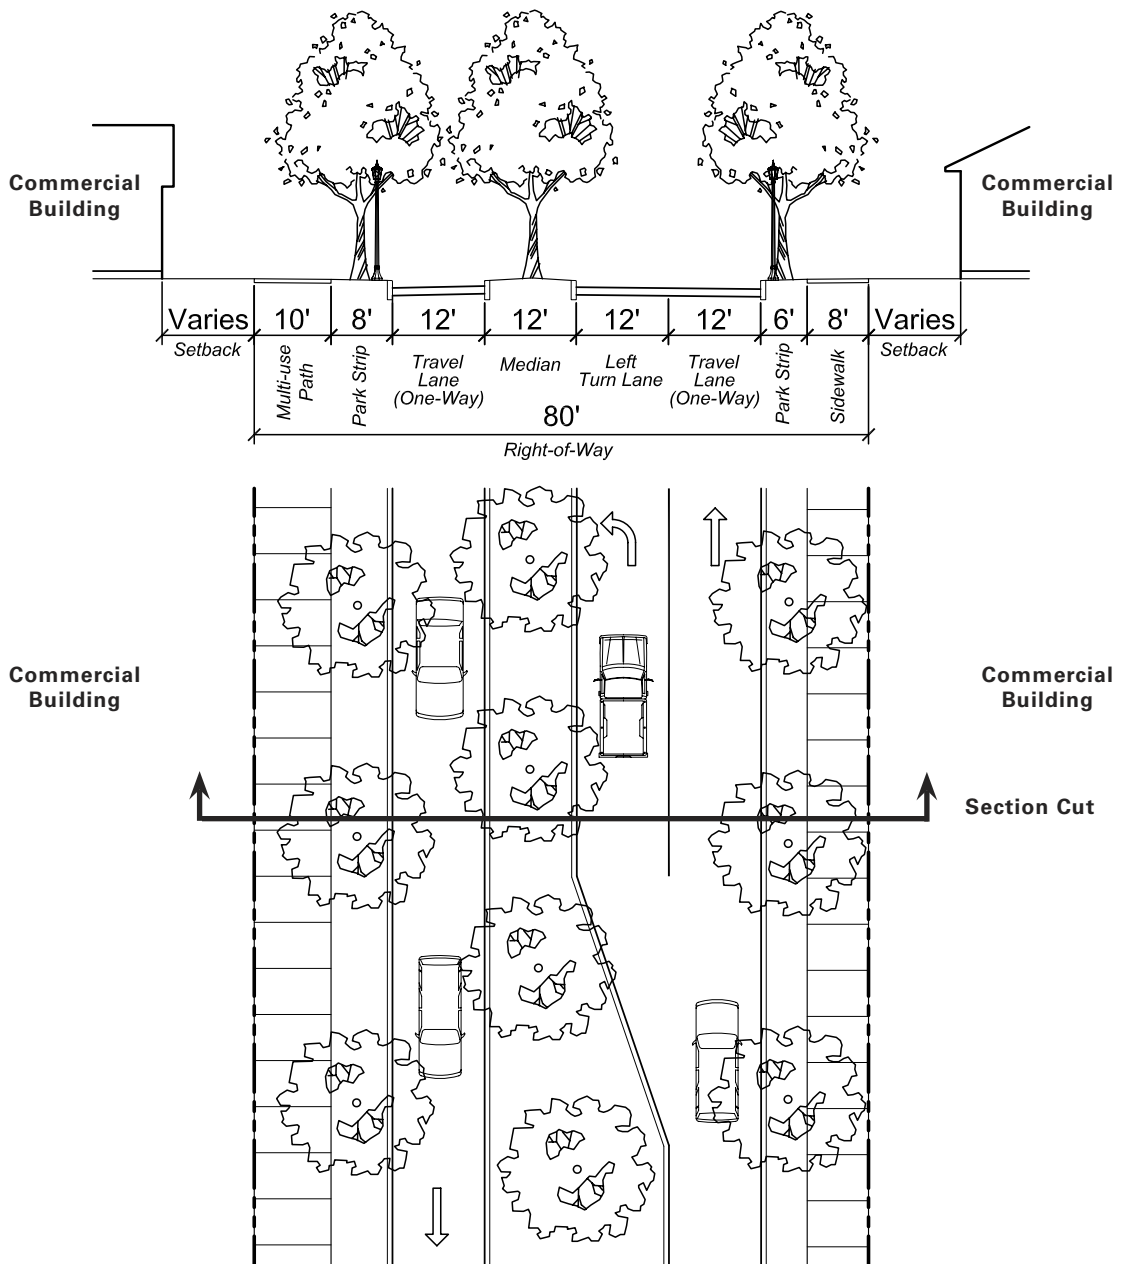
Proposed Section and Plan: Village Center Street B
